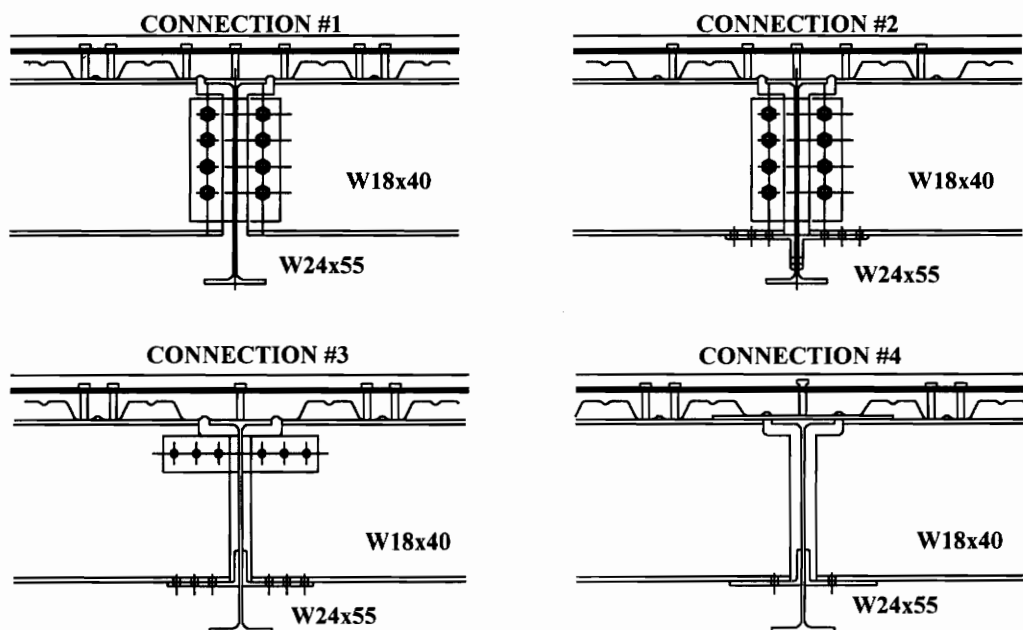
Composite Semi-Rigid Beam-to-Girder Connections
